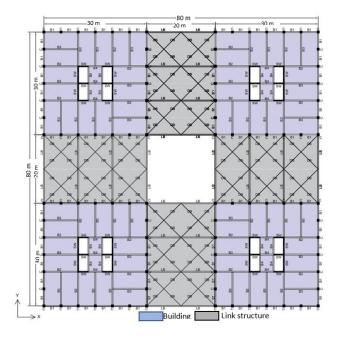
(b). Typical floor plan of Conjoined buildings with link structure.
